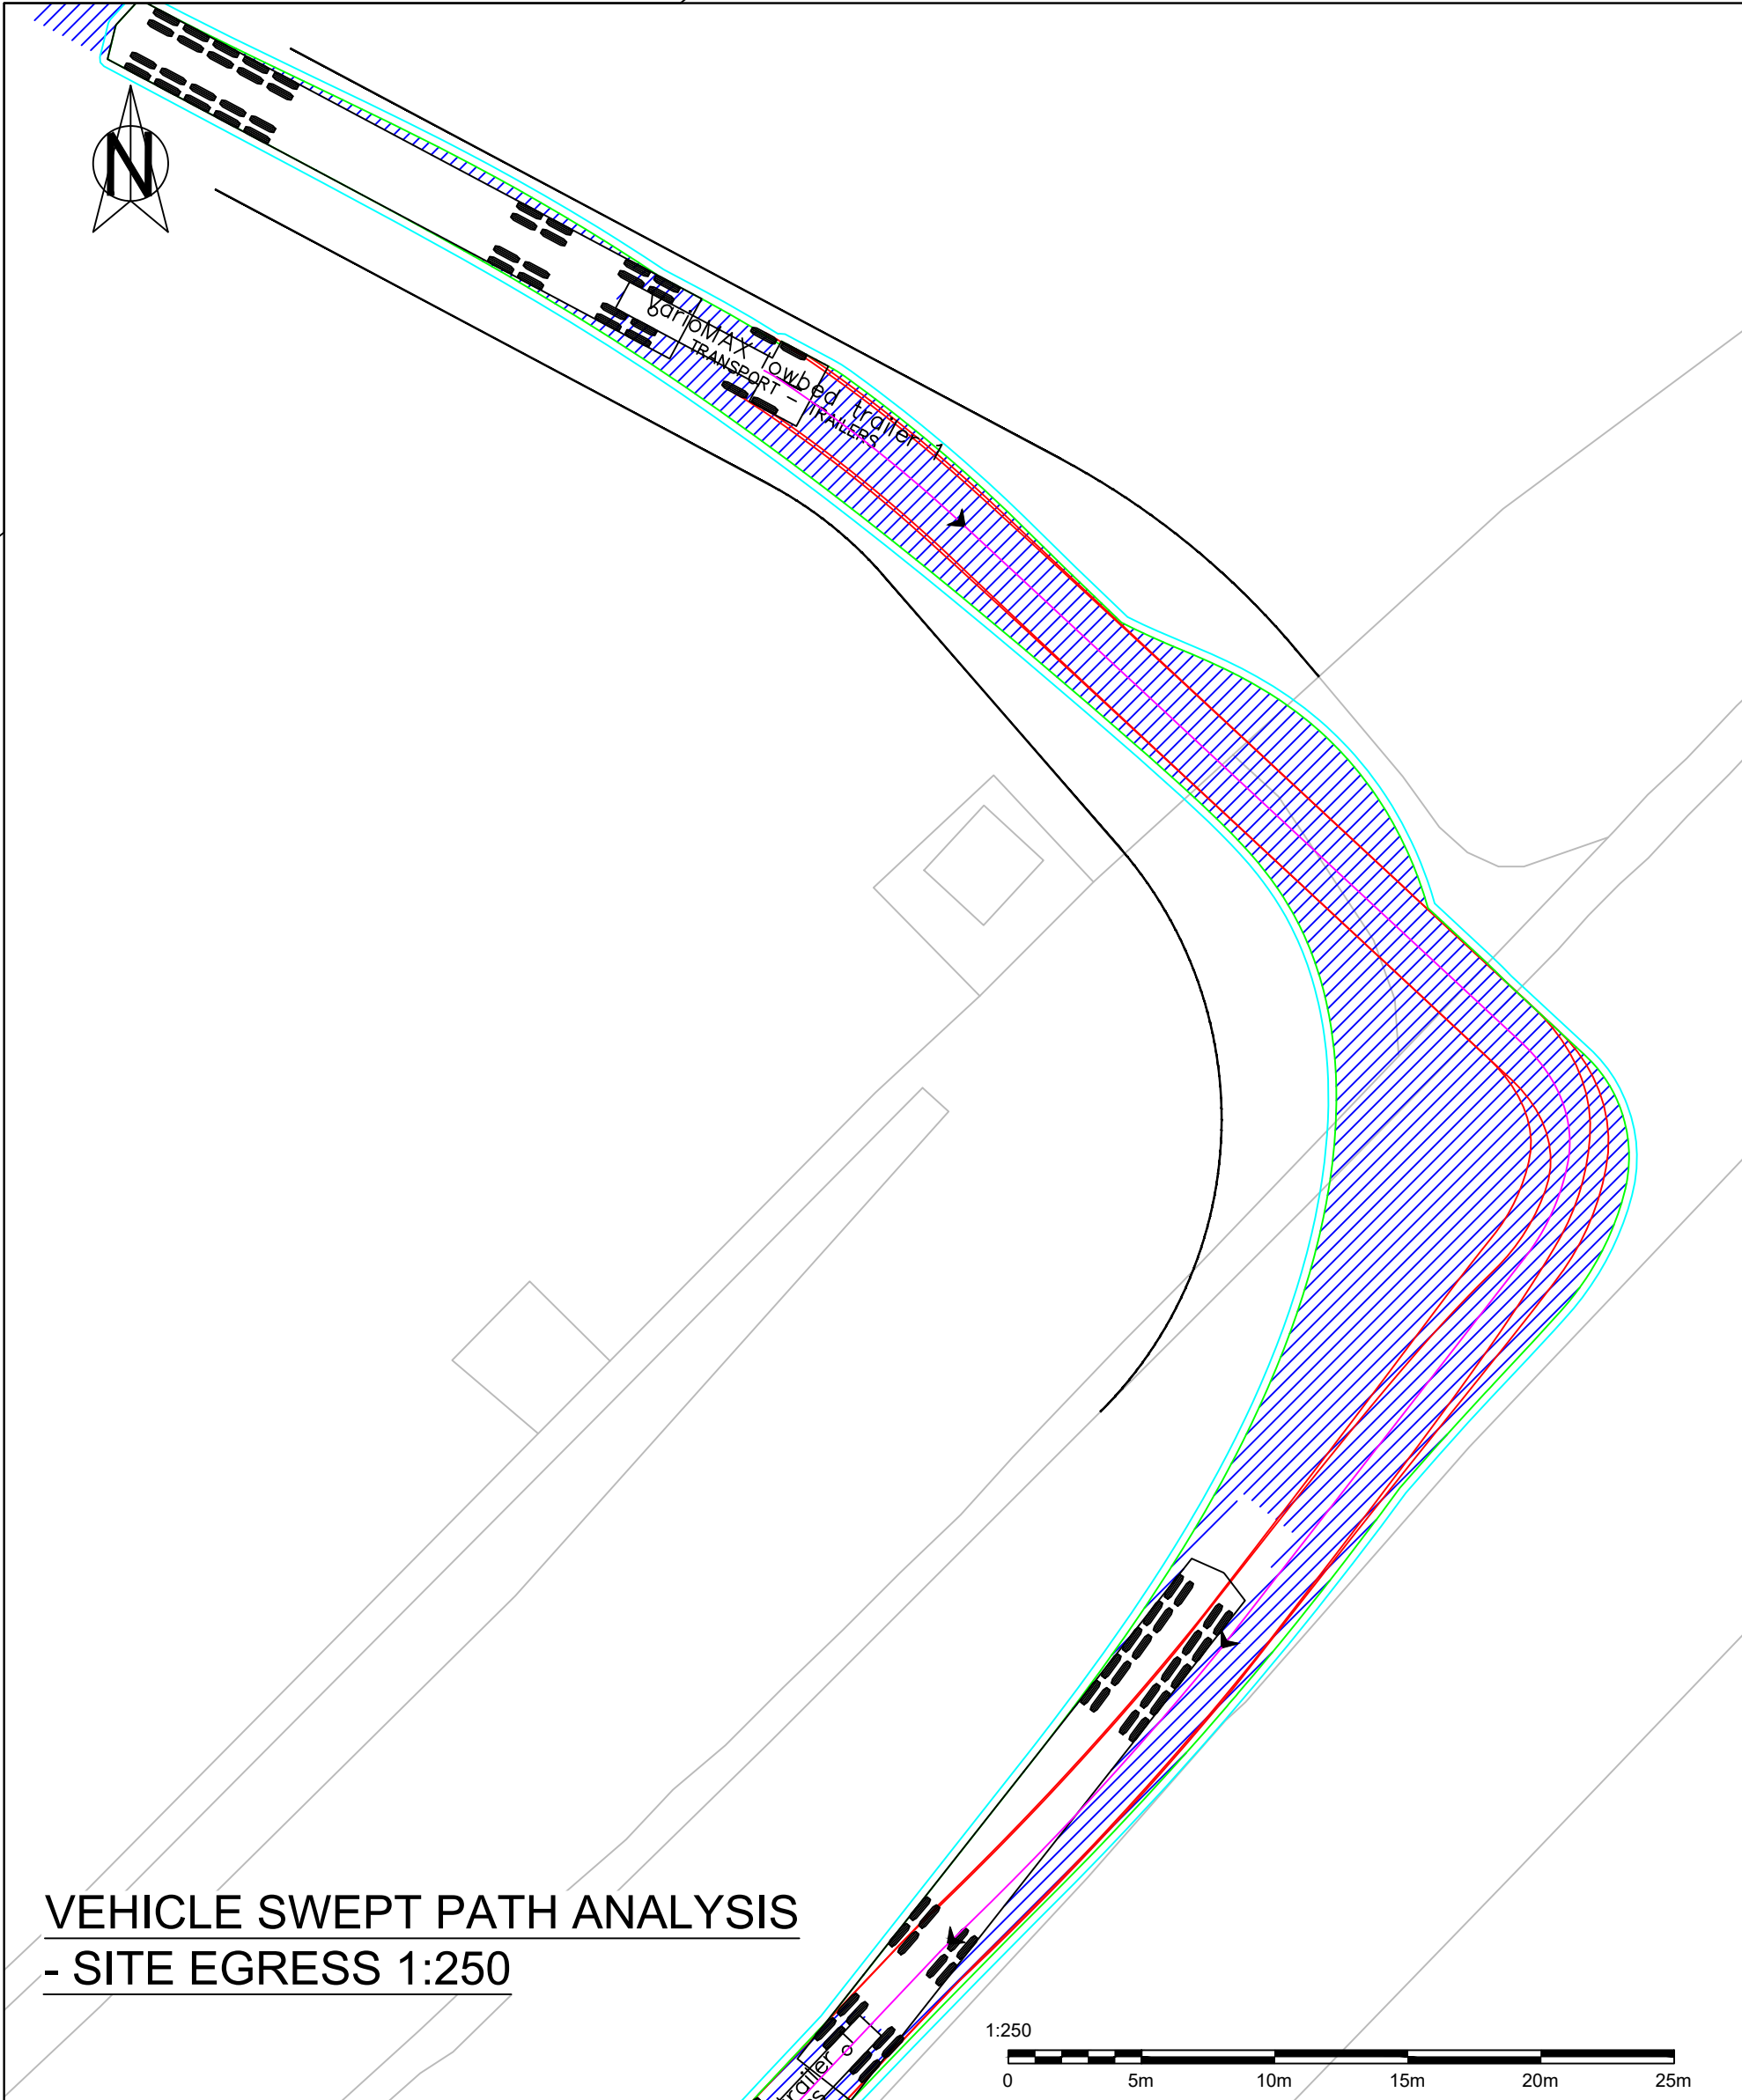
KMC-XX-CR8-9-DR-CH-0001	Rev C
